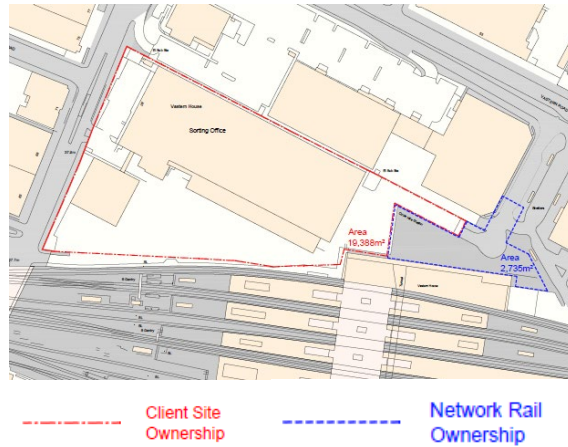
Extract of Existing Site Location Plan with Ownership Boundary A11113 C 2001 P1
